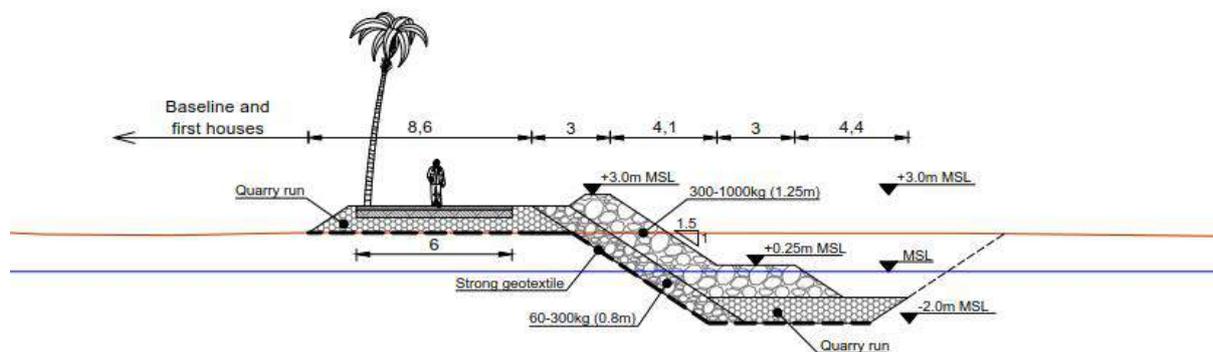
Principle cross-section revetment light - New Kru Town - Chainage 0 - 600m
